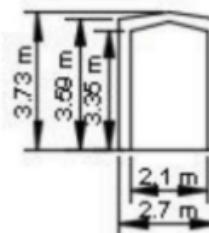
Main entrance wooden door on the ground floor level of the central hall, Senate hall building.
